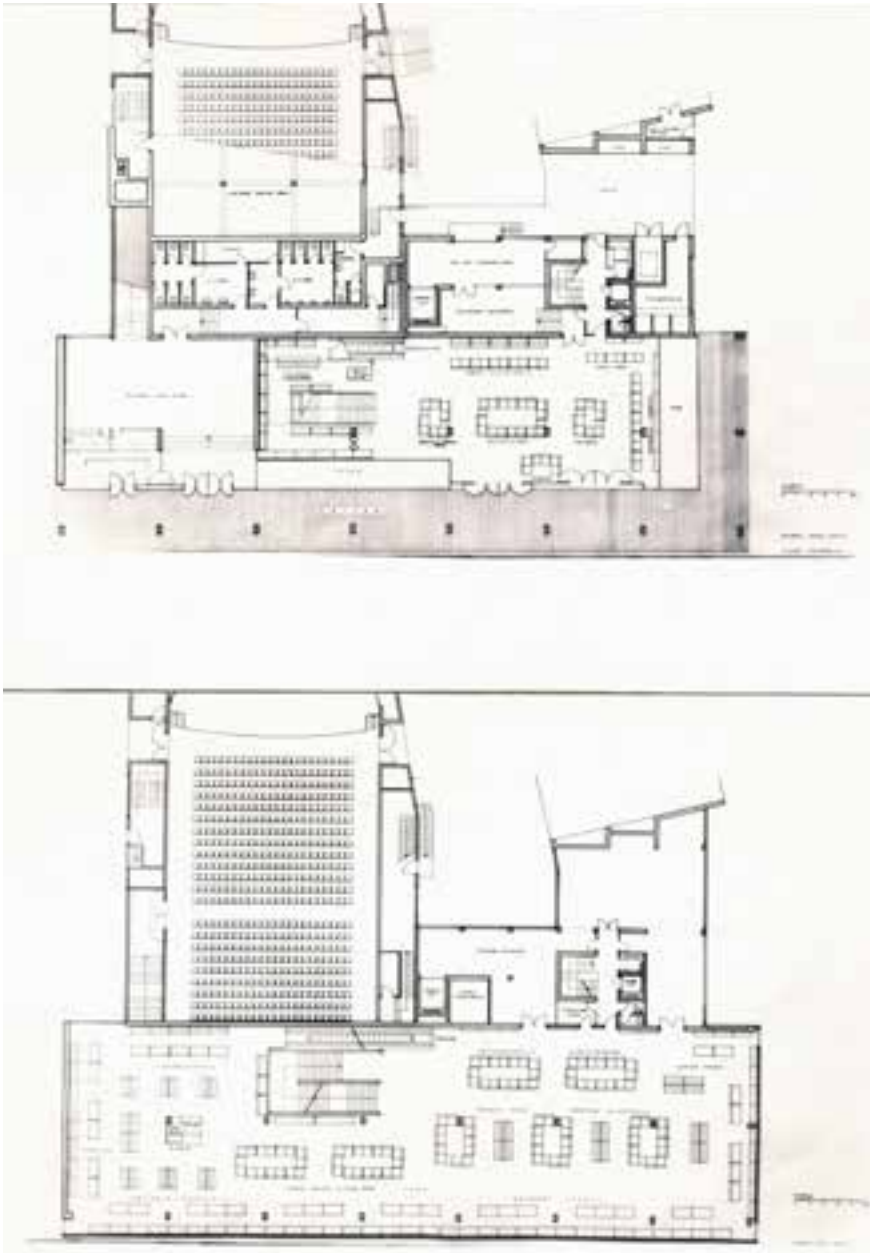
Antun Šatara, PRIMA department store, Split, Croatia, 1966, ground floor and the first floor plan. Credits: State Archives in Split.
